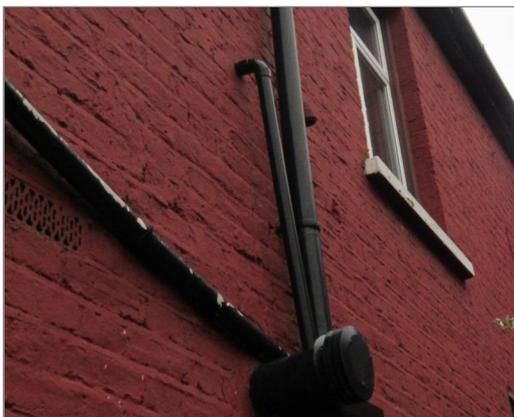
Gaps were noted in the mortar pointing on the rear elevation
